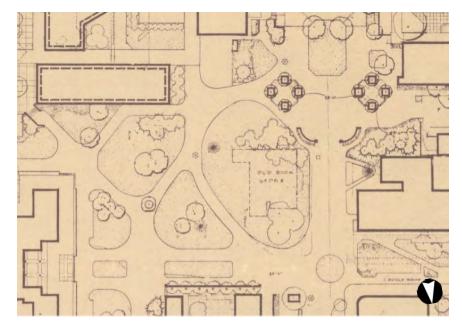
1967 demolition plan for Career Planning and Placement Center project. Note, this plan does not show the 1930 Shoe Repair Shop addition, which does appear on a subsequent 1977 plan. Source: Stanford University.
